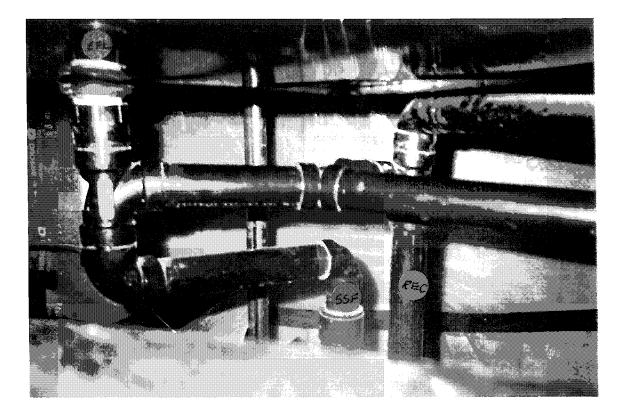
BIOFILTER EFFLUENT PIPING SYSTEM
